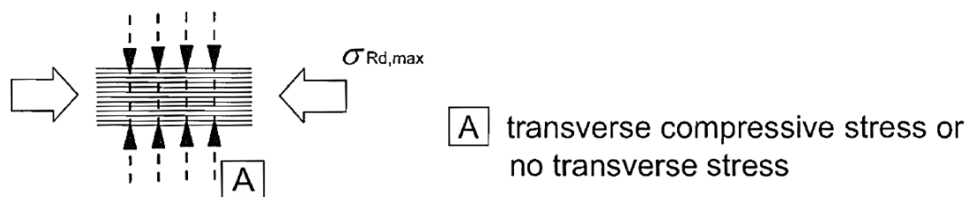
Design strength of concrete struts without transverse tension [28].
